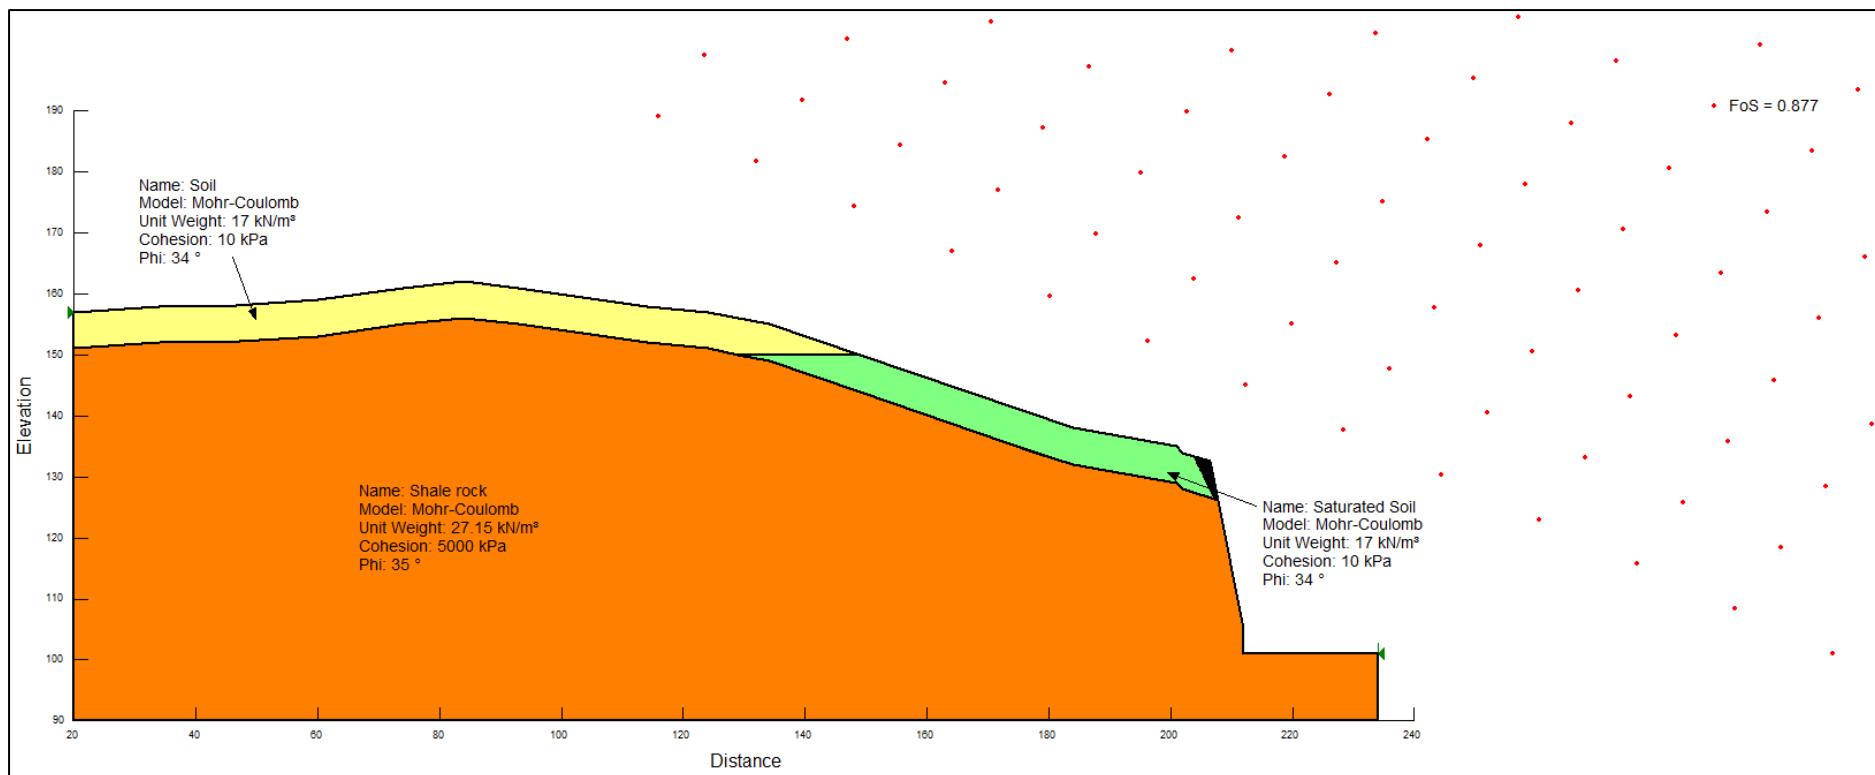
E.6: Inlet portal, Section 1, 1:0.2 excavation slope in shale, 1:2 excavation slope in soil
